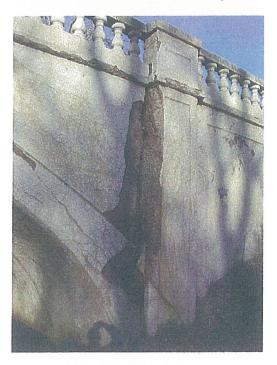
Deterioration of Concrete at Construction Joint at Northeast Corner of Arch
